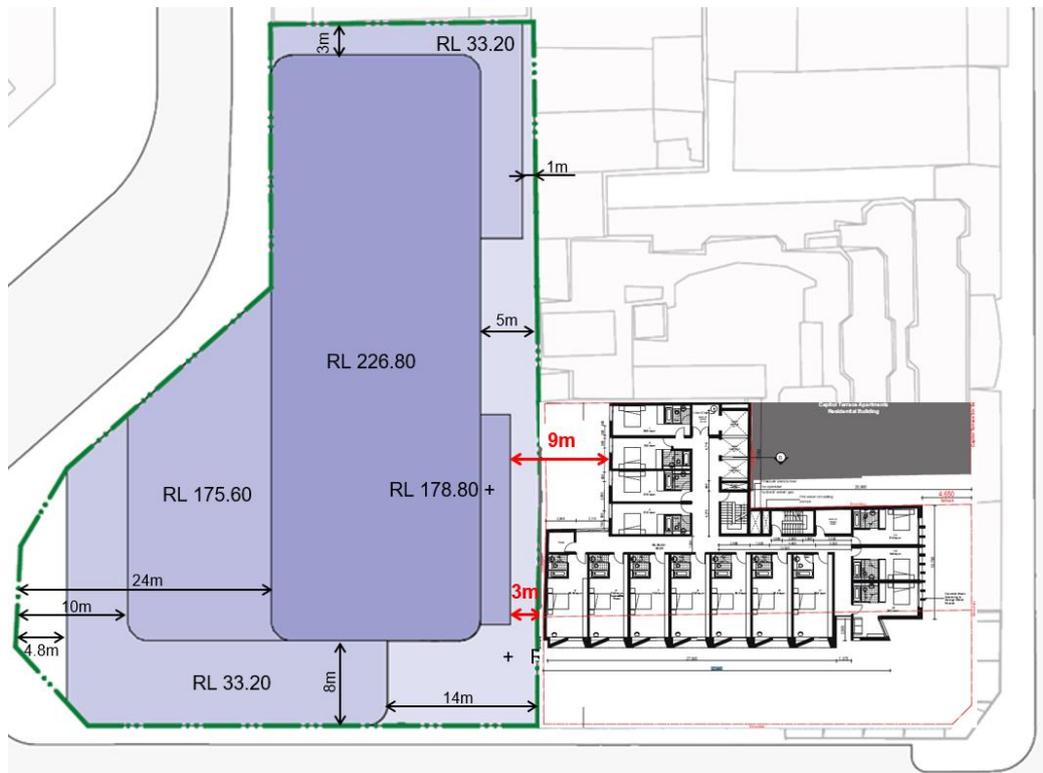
Indicative plans detailing the revised eastern setback of the planning envelope and separation to the west facing hotel rooms approved for the 757-763 George Street site.
